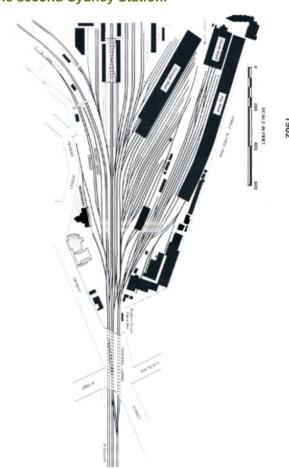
Modern arrangement of 1902 plan of the second Sydney Station.¹⁵¹
